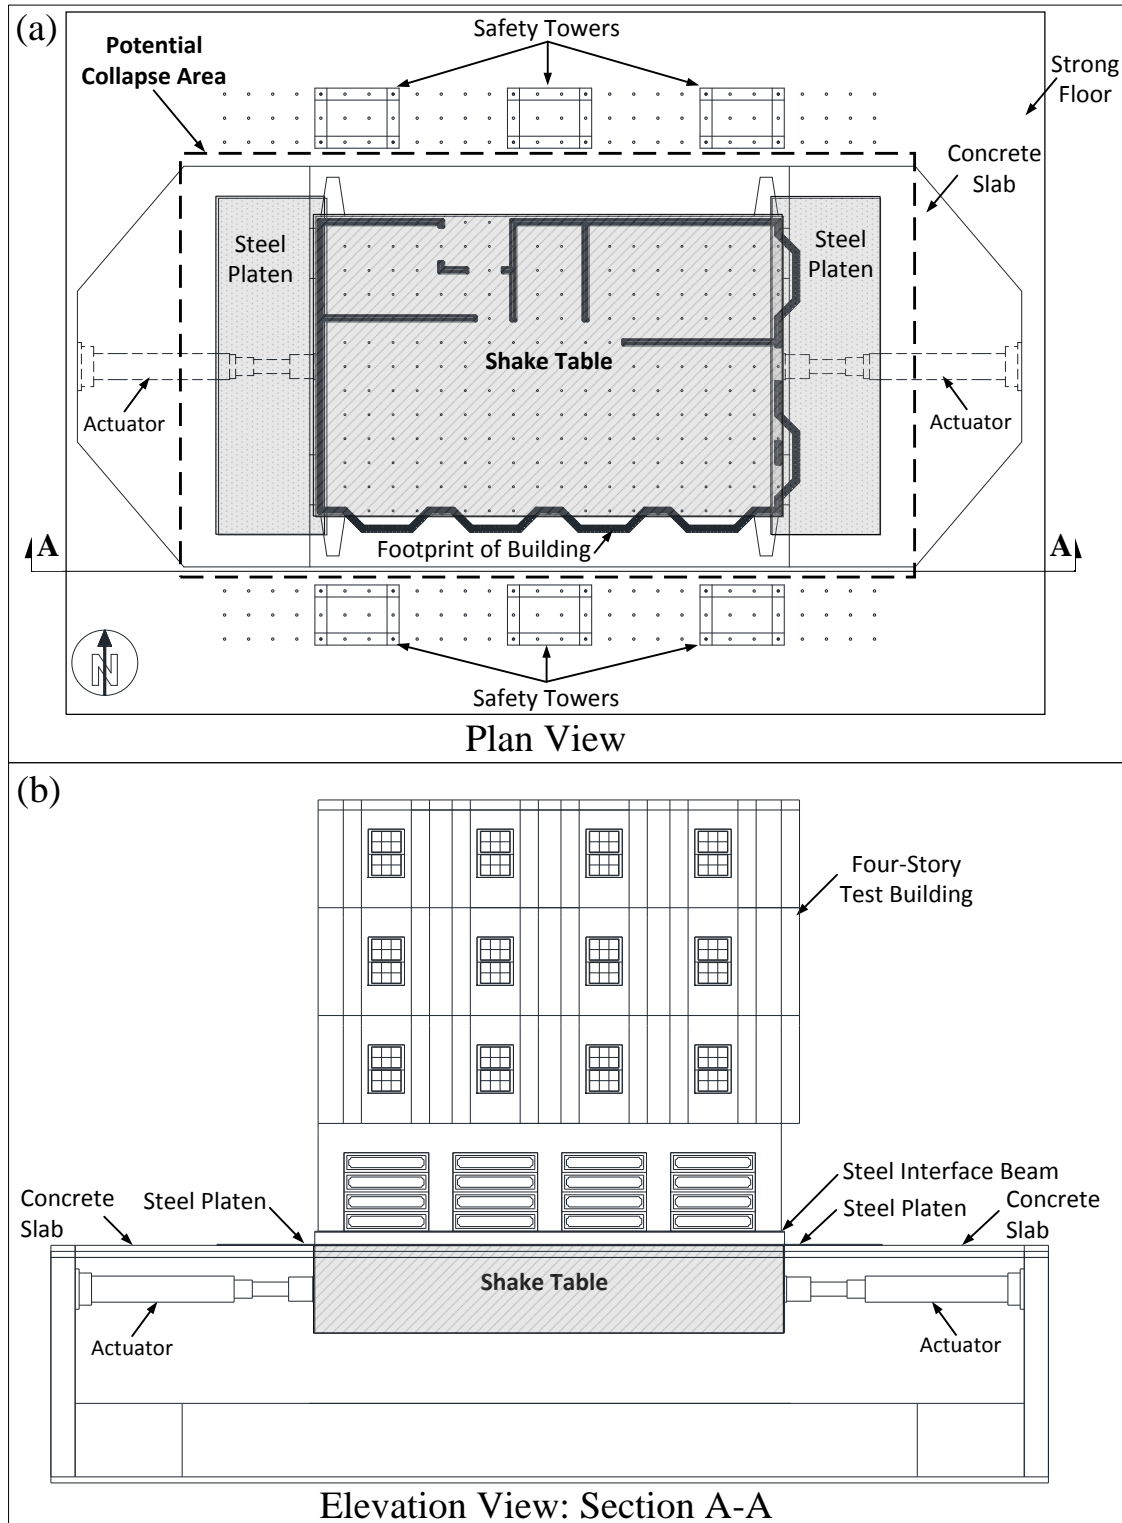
Position of the four-story building with its potential collapse area on top of the shake table: (a) plan view, and (b) elevation view (section A-A).
